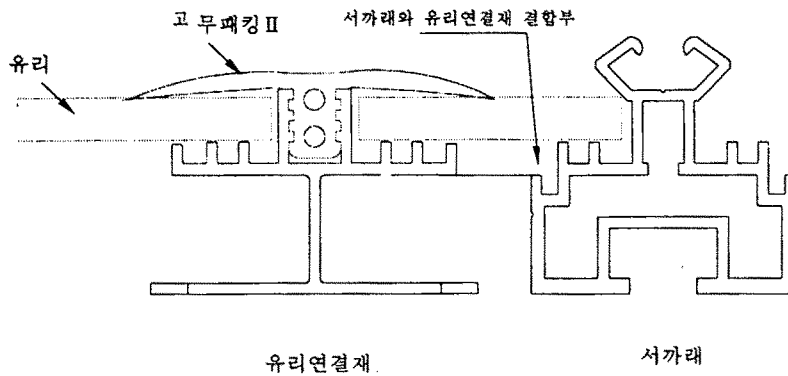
Cross-section of combining glass coupling member and rafter("J" details)
